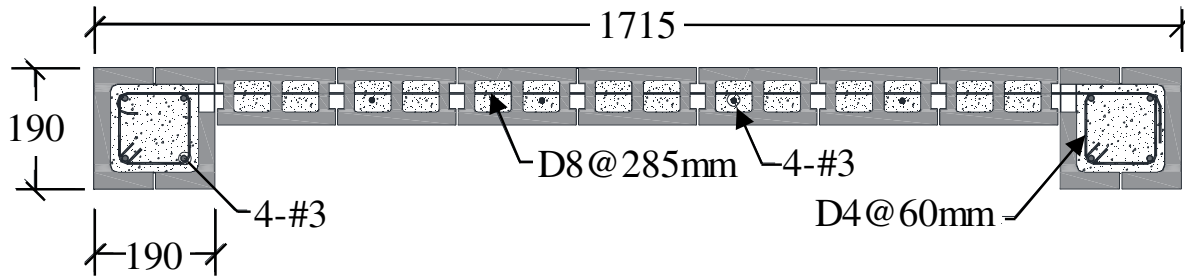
Cross-section of tested walls (all dimensions are in mm)
